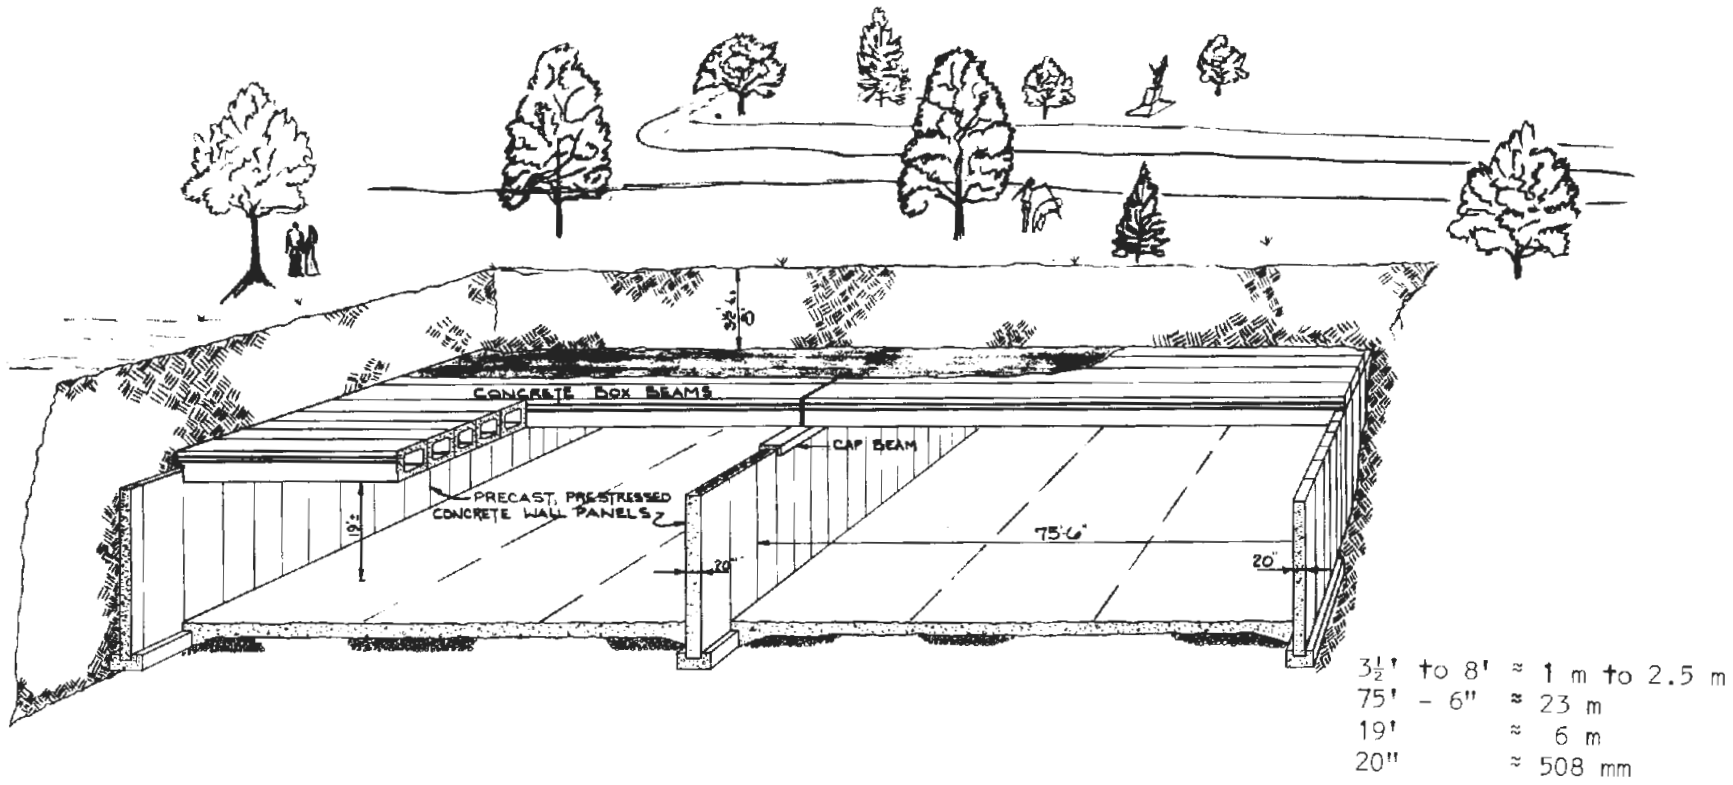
Schematic drawing of Case Study 2, a highway tunnel through a park, showing tunnel construction using prefabricated structural members
